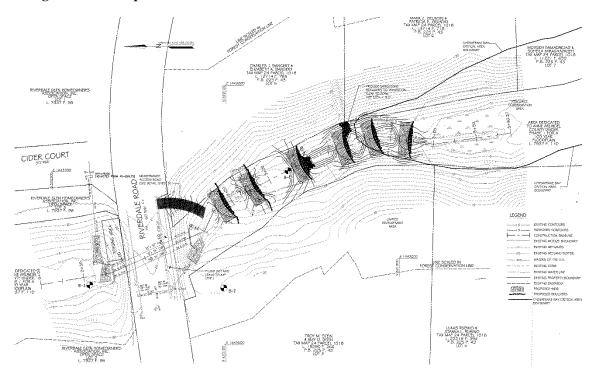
Example Retrofit of Eroded Outfall – Severn Drive Outfall Repair
